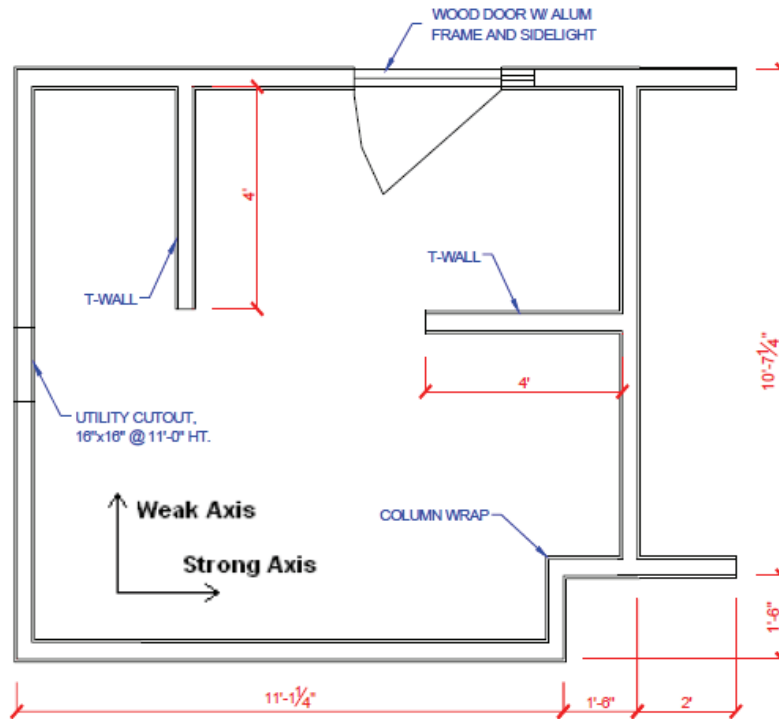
Plan View of Test Specimen (after Lang and Restrepo, 2005)
